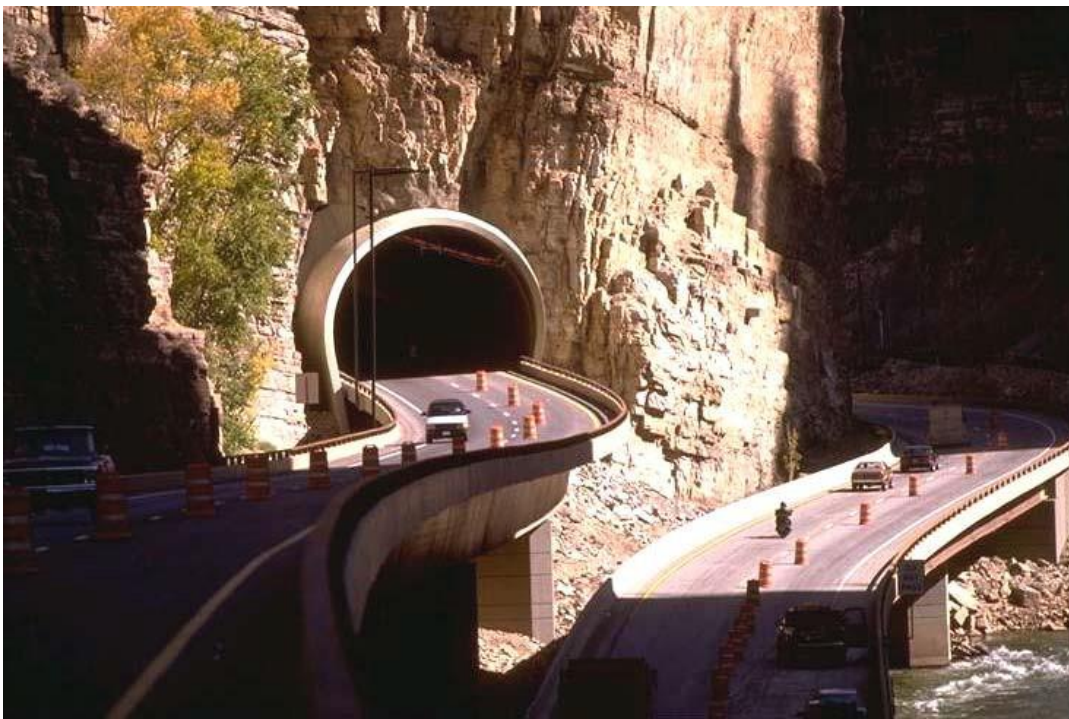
Glenwood Canyon Hanging Lake Tunnels
